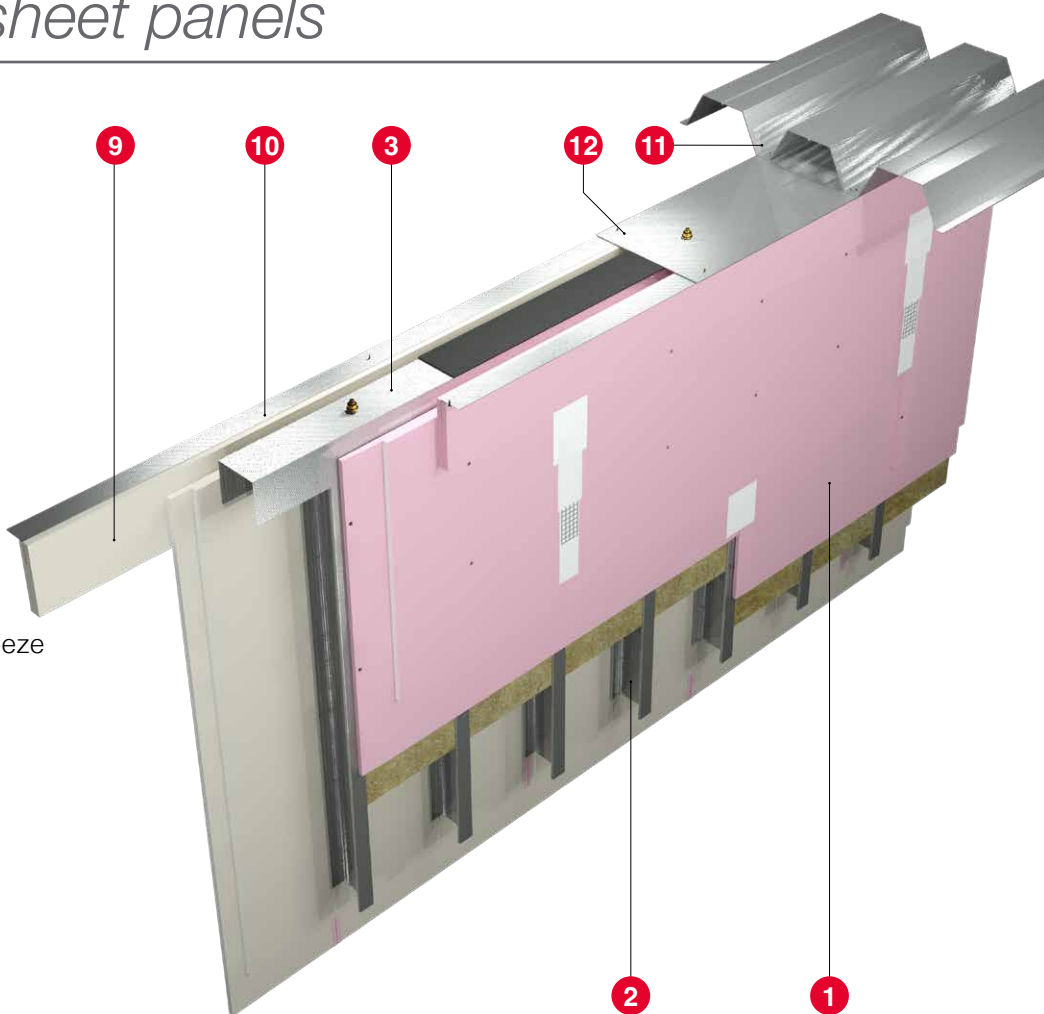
Connecting a partition wall with trapezoidal sheet panels – diagonally across the trapeze (alternatively plasterboard spacers can be used – see Fig. 7)
